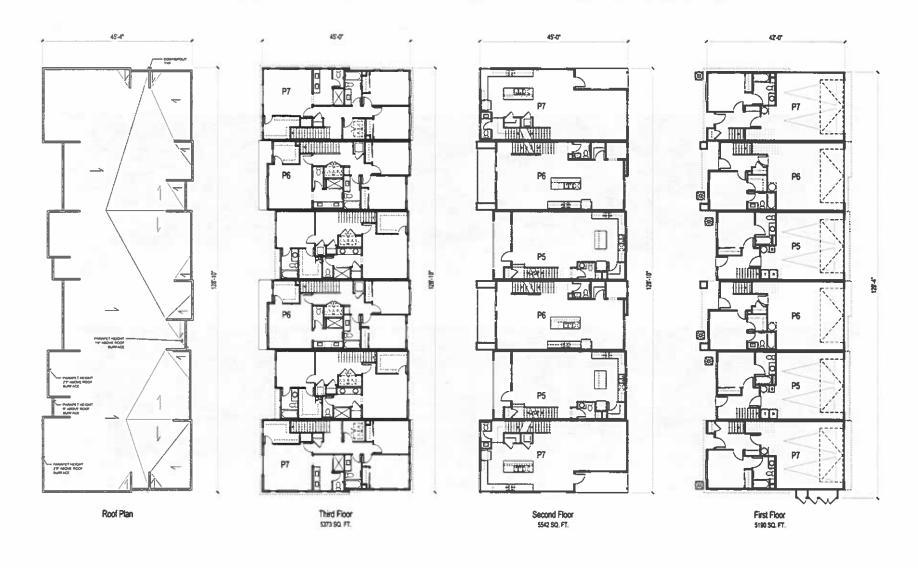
Conceptual Architecture - 6-Plex Building Floor Plan "F"
